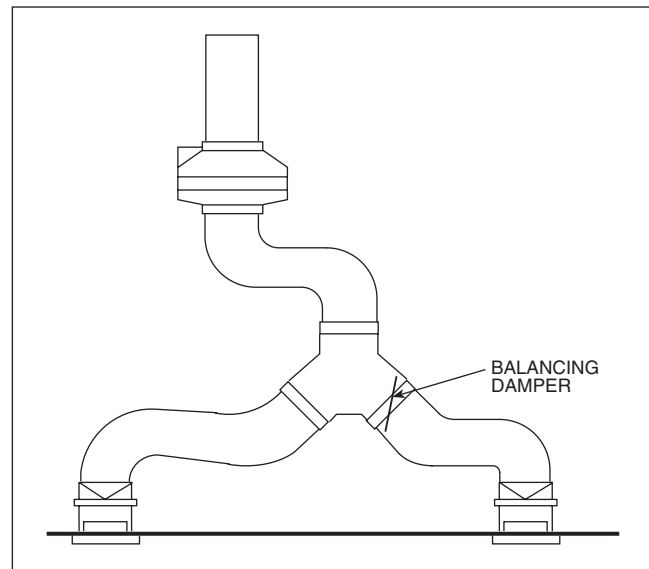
Deluxe Kit Balancing Damper — Installed
